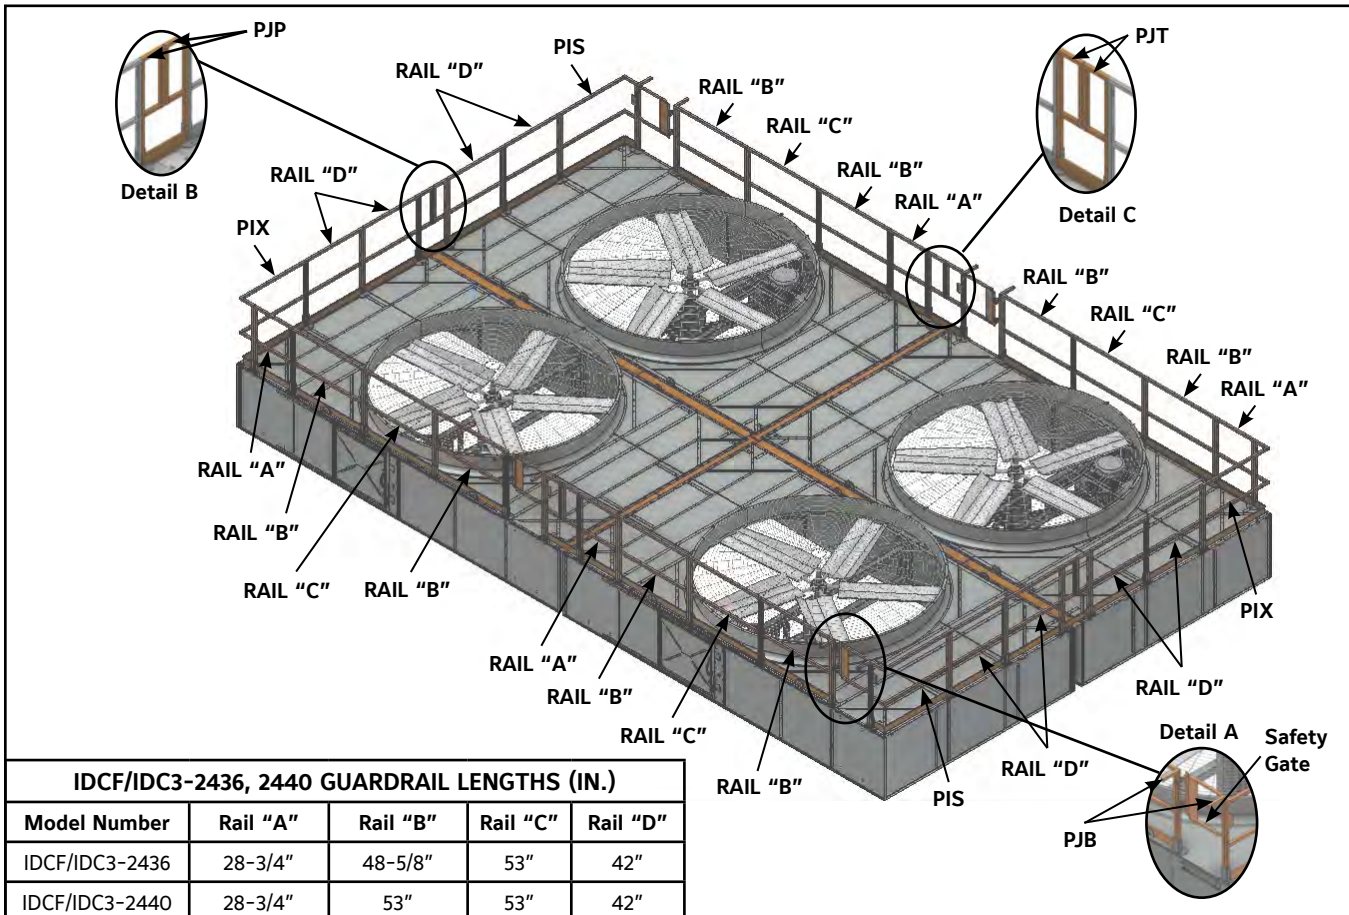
Top Perimeter Guardrails - 2436, 2440
